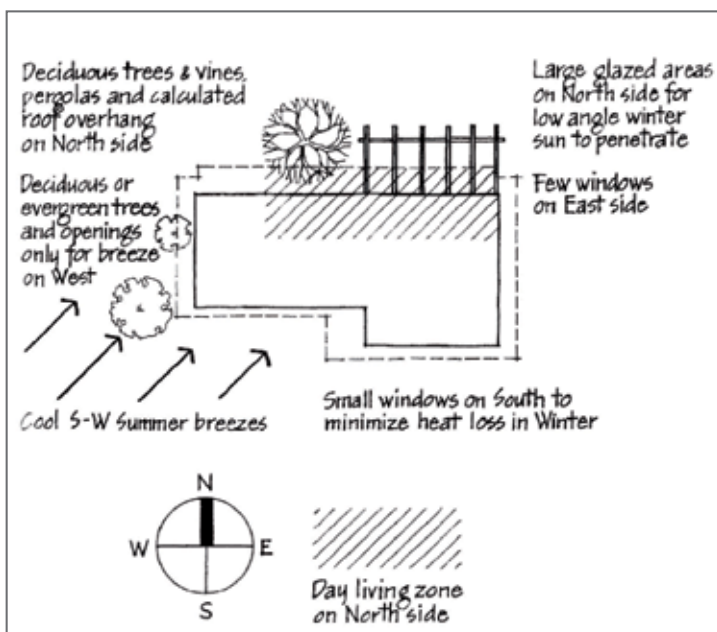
Some practical design measures for siting and designing a dwelling (Source: WAPC, 2008)
